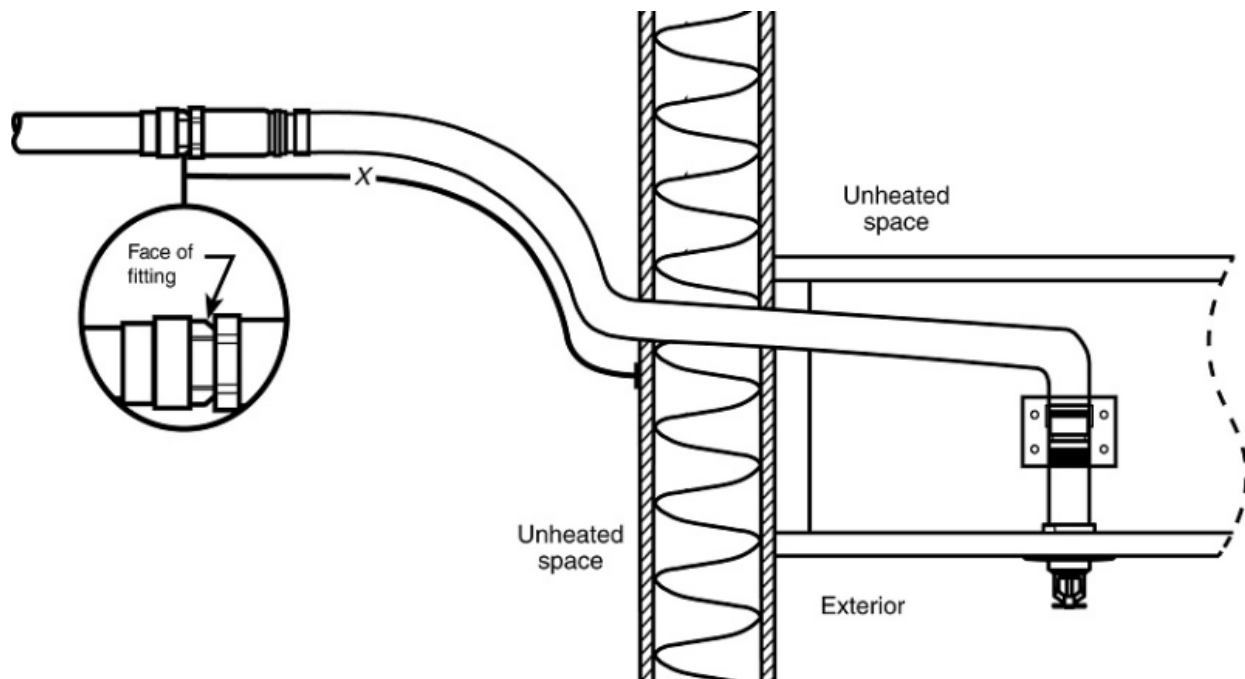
(d) Dry Pendent Sprinkler Through Ceiling
